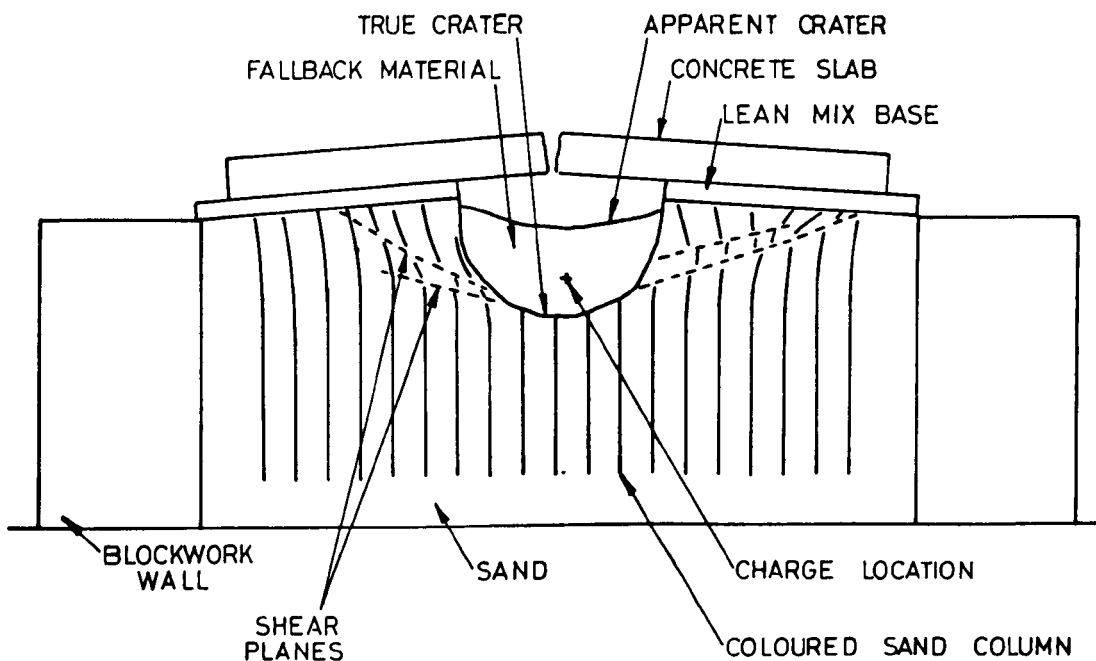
CRATER FORMED IN CRUSTED SAND BY A 16g SUBSURFACE EXPLOSIVE CHARGE
